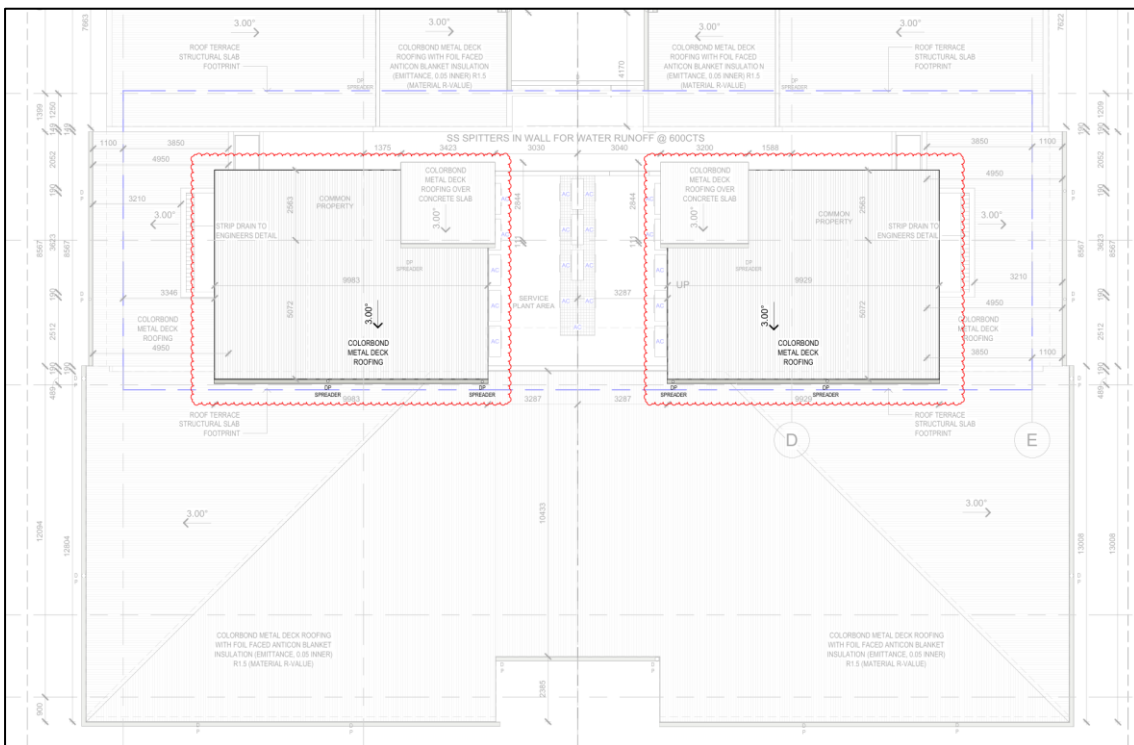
Roof Plan – Extract (Source: ThinkTank Architects)
